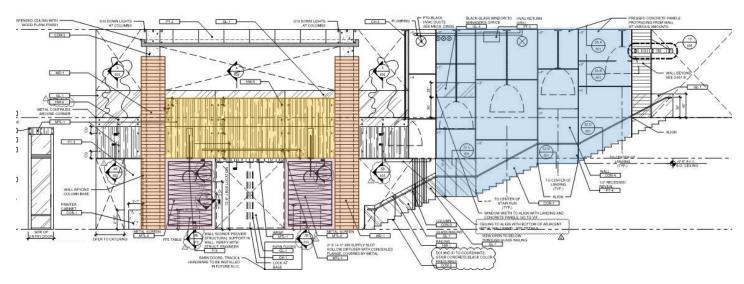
| Ground Floor Interior Elevation - Lower Level Lobby
